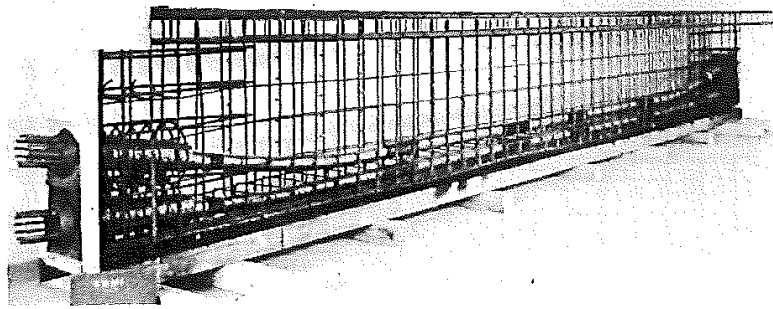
Case PB4. Reinforcement details and cross-sectional dimensions (in cm) (Leonhardt et al. 1973)
